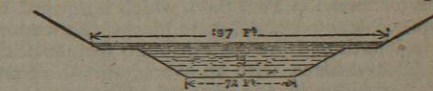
Cross-section of Suez Canal at El Guisir.
